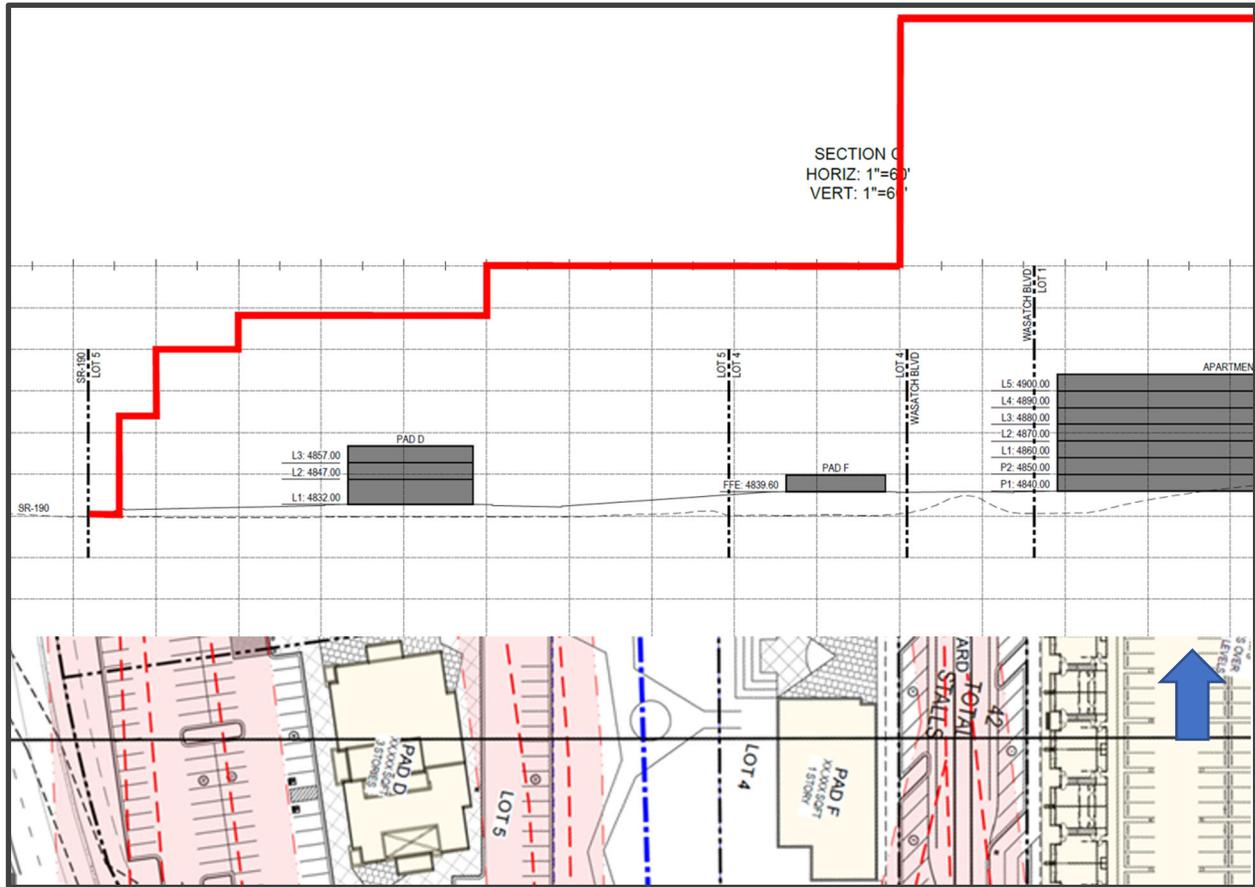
SOUTH BUILDINGS - HEIGHT CROSS SECTION (RED MAXIMUM HEIGHT PERMITTED)
